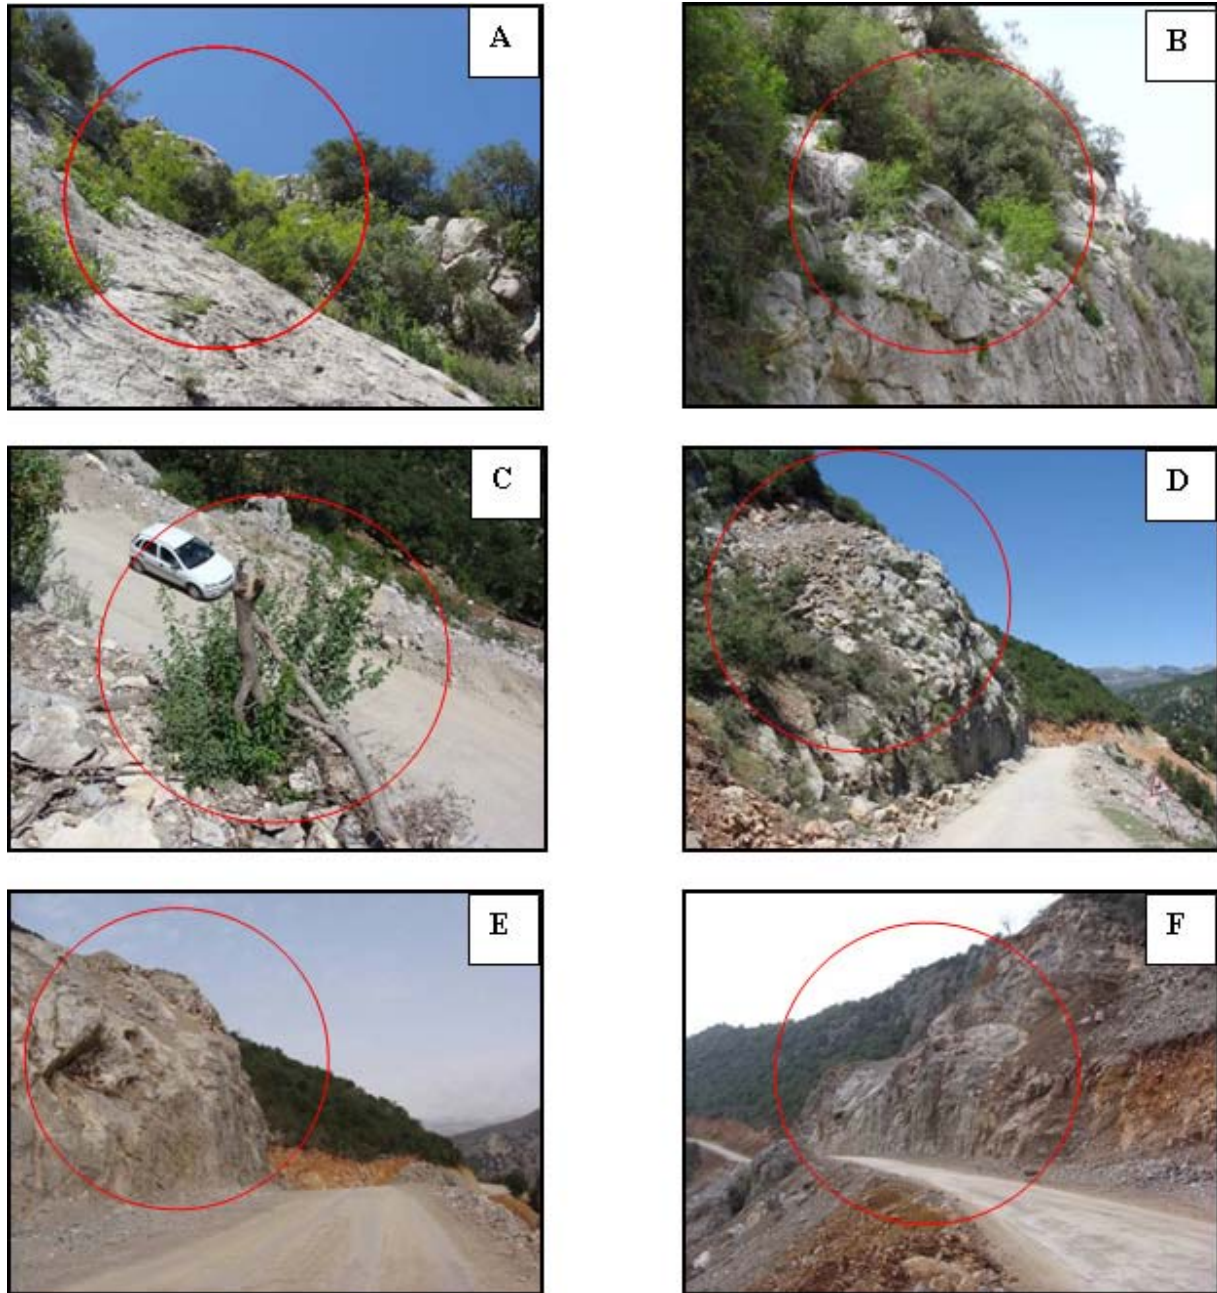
One of the destroyed occupation areas of *F. anatolica* around of the highway between Andırın and Kadirli. A-B-C-D: *F. anatolica* individuals before the road construction. E-F: no individuals after the road construction.
